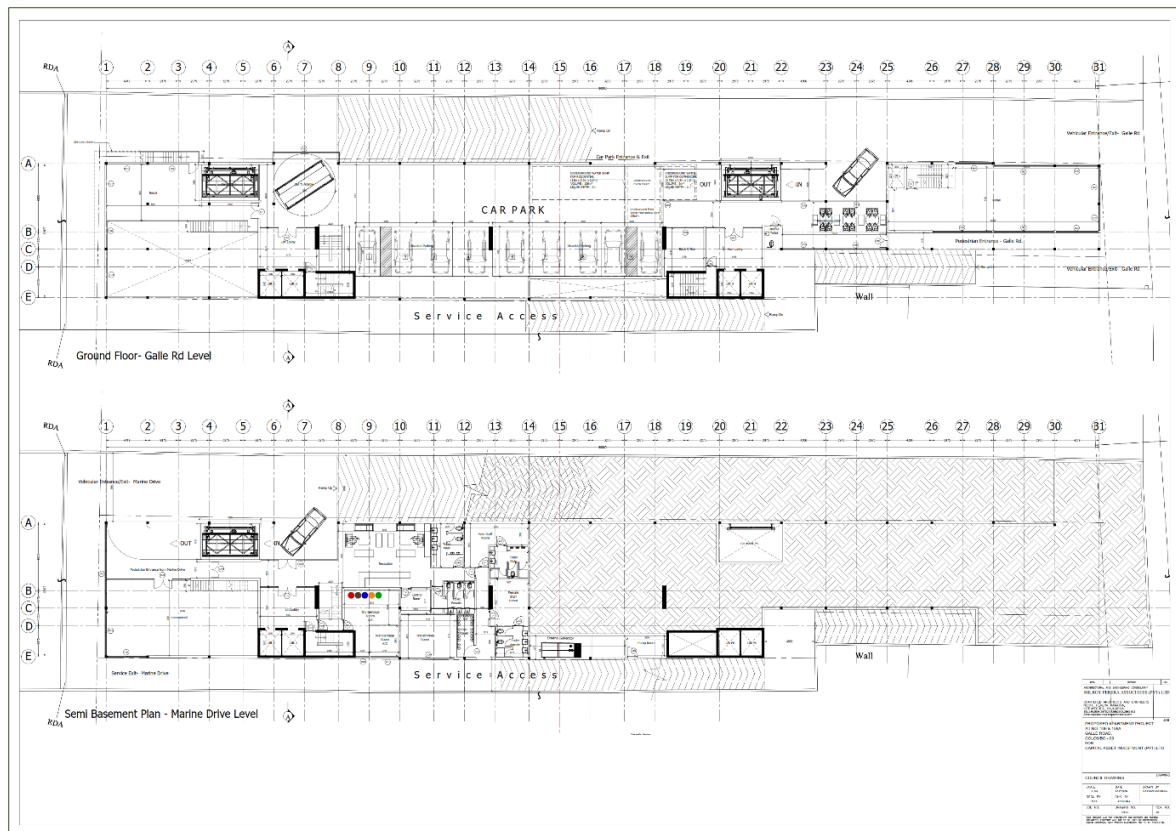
Ground Floor and Semi Basement plan of the proposed site
